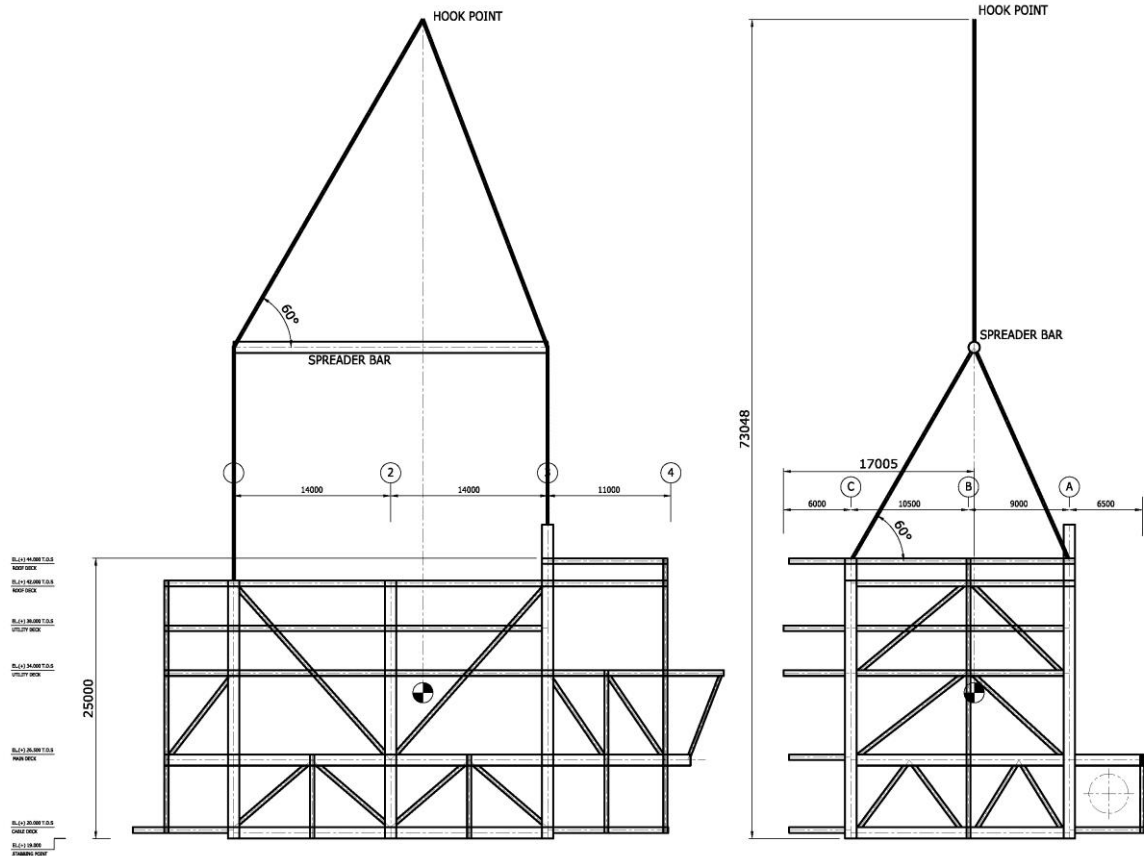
Lift height of topside with alternative lifting rigging arrangement
